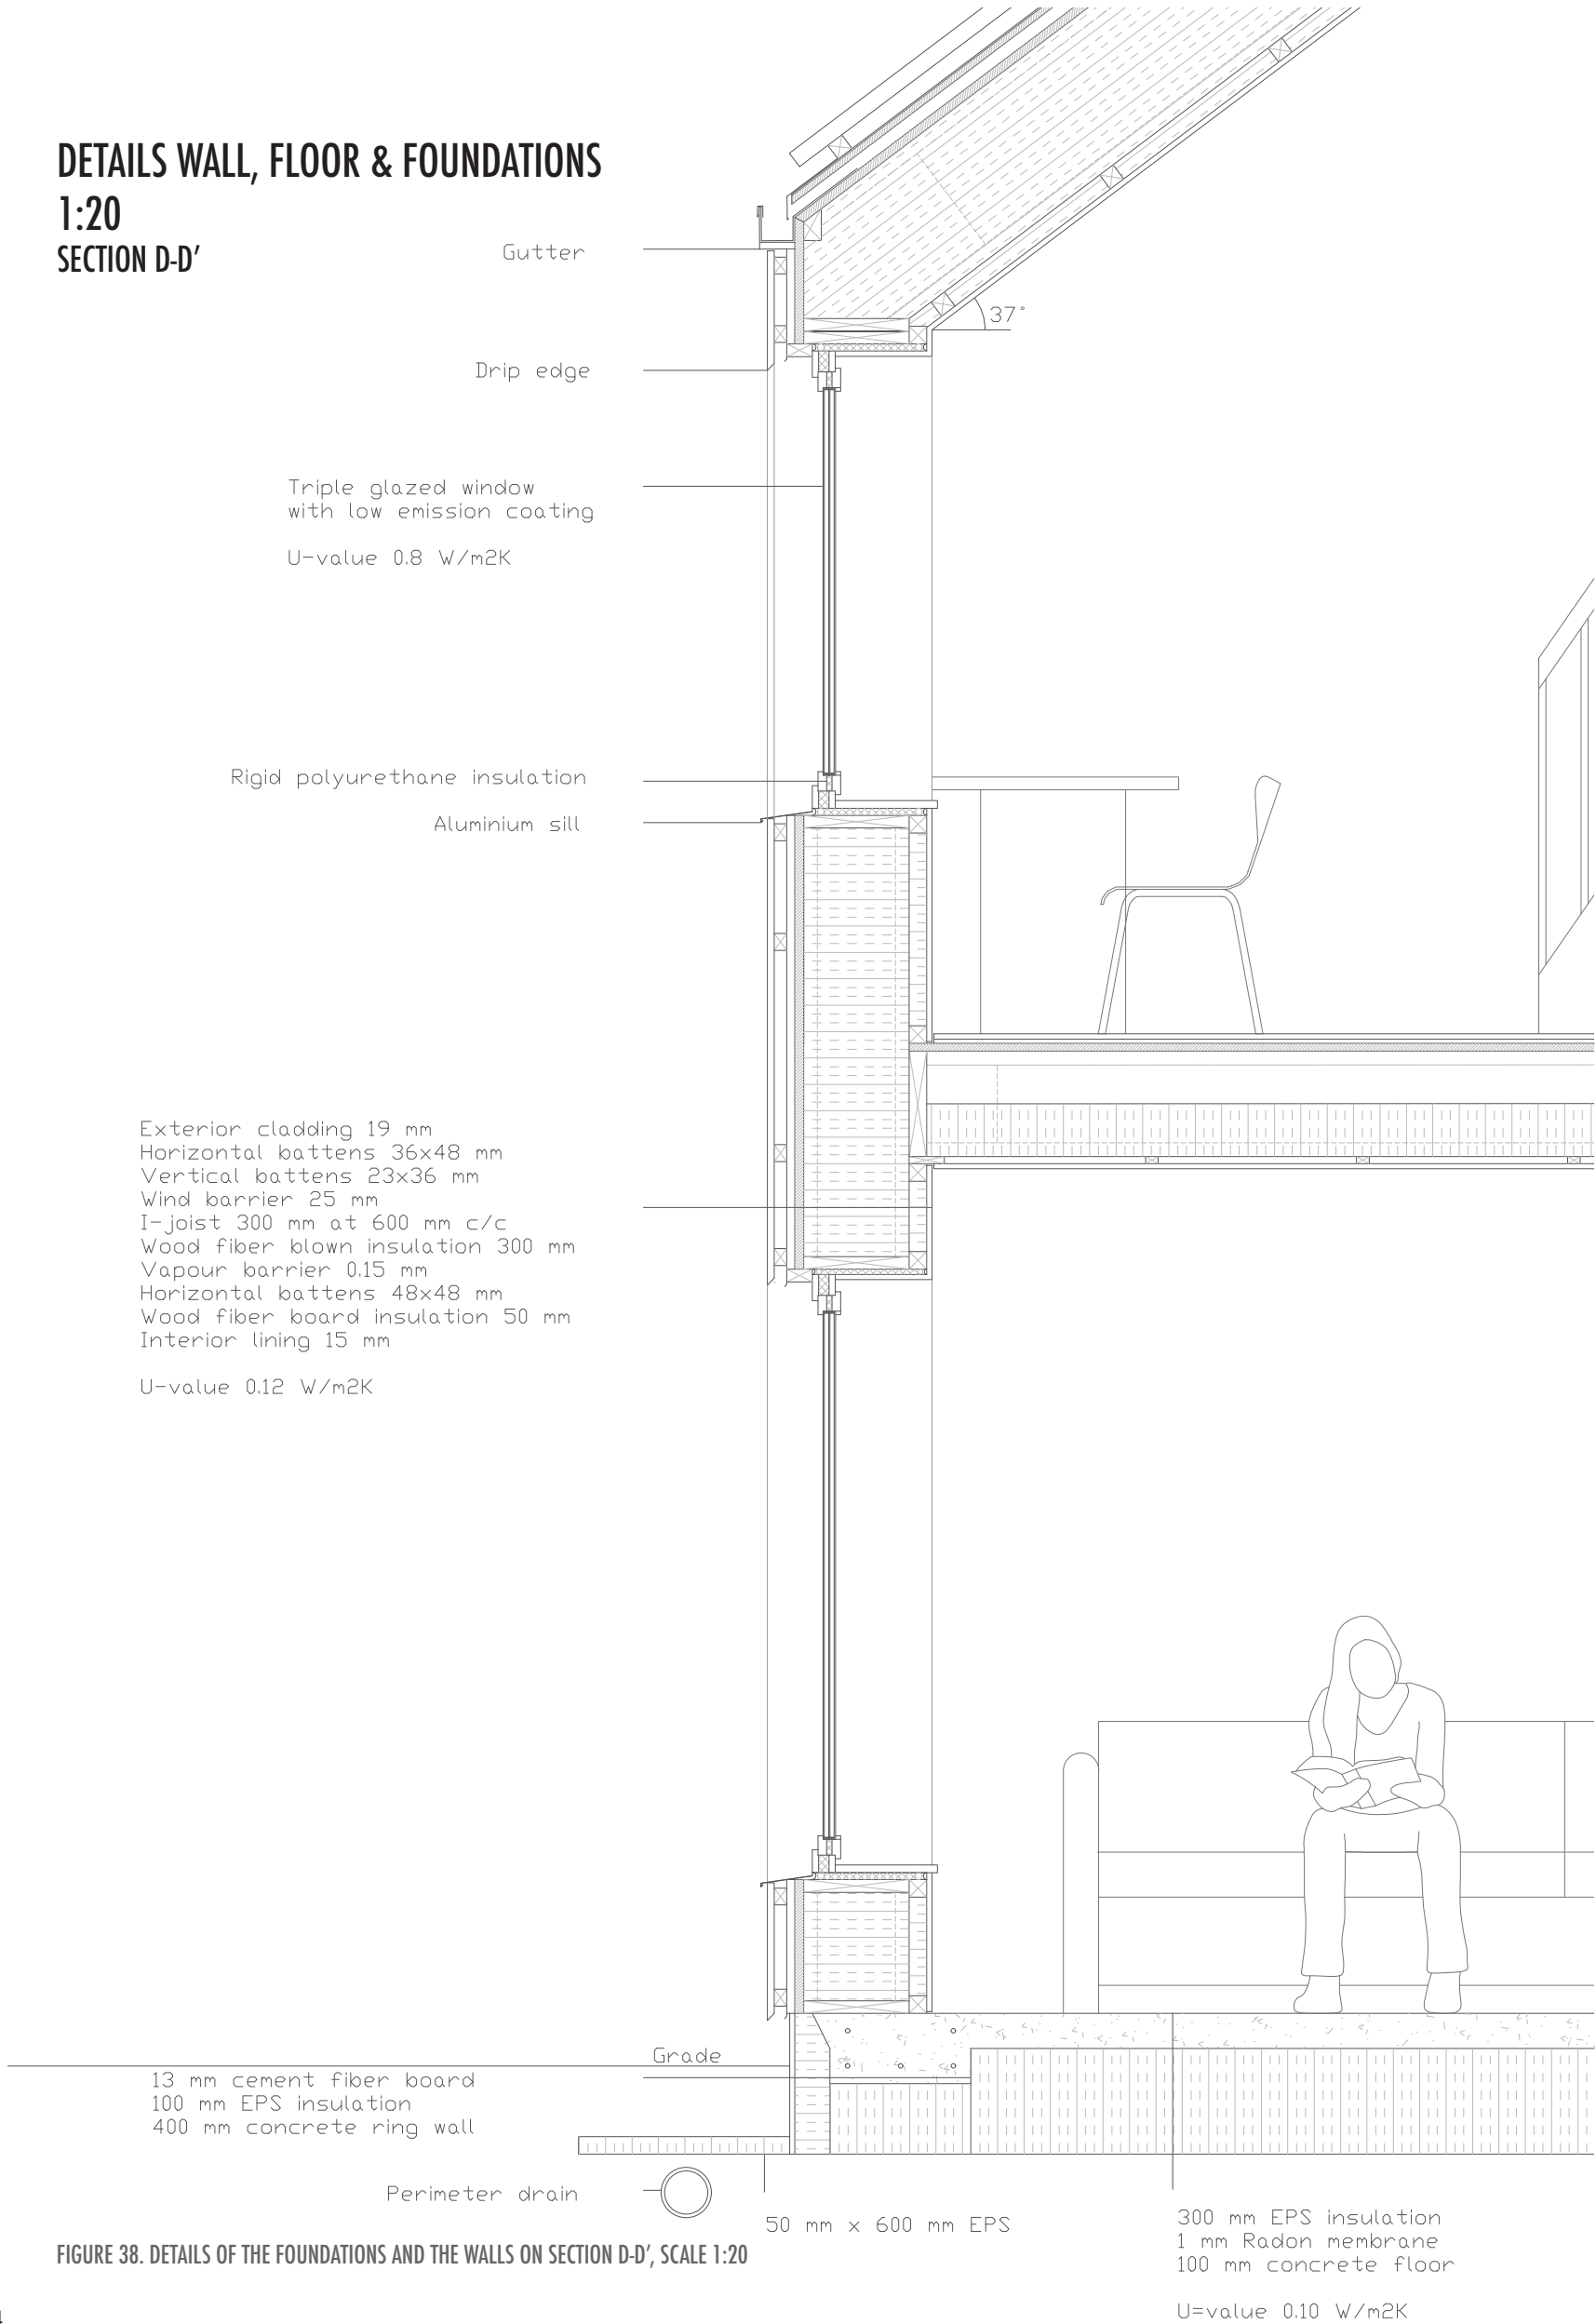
DETAILS OF THE FOUNDATIONS AND THE WALLS ON SECTION D-D', SCALE 1:20
